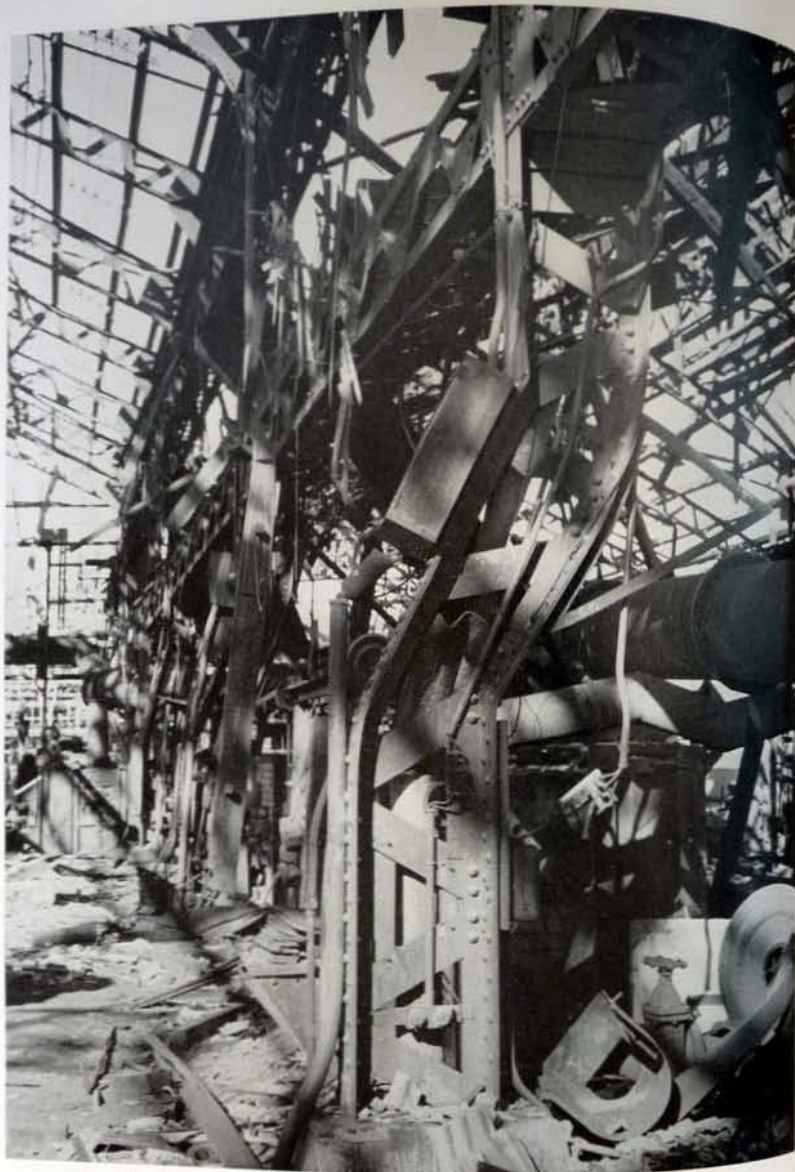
5,000 feet from GZ. Group 4. Building 5. Close-up main columns, looking west.
